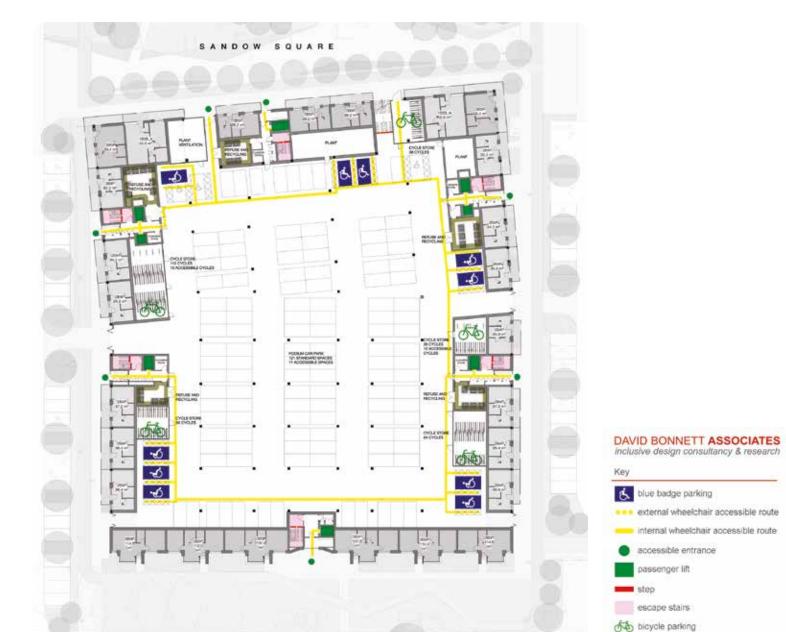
Block C General Arrangement - Ground floor level
